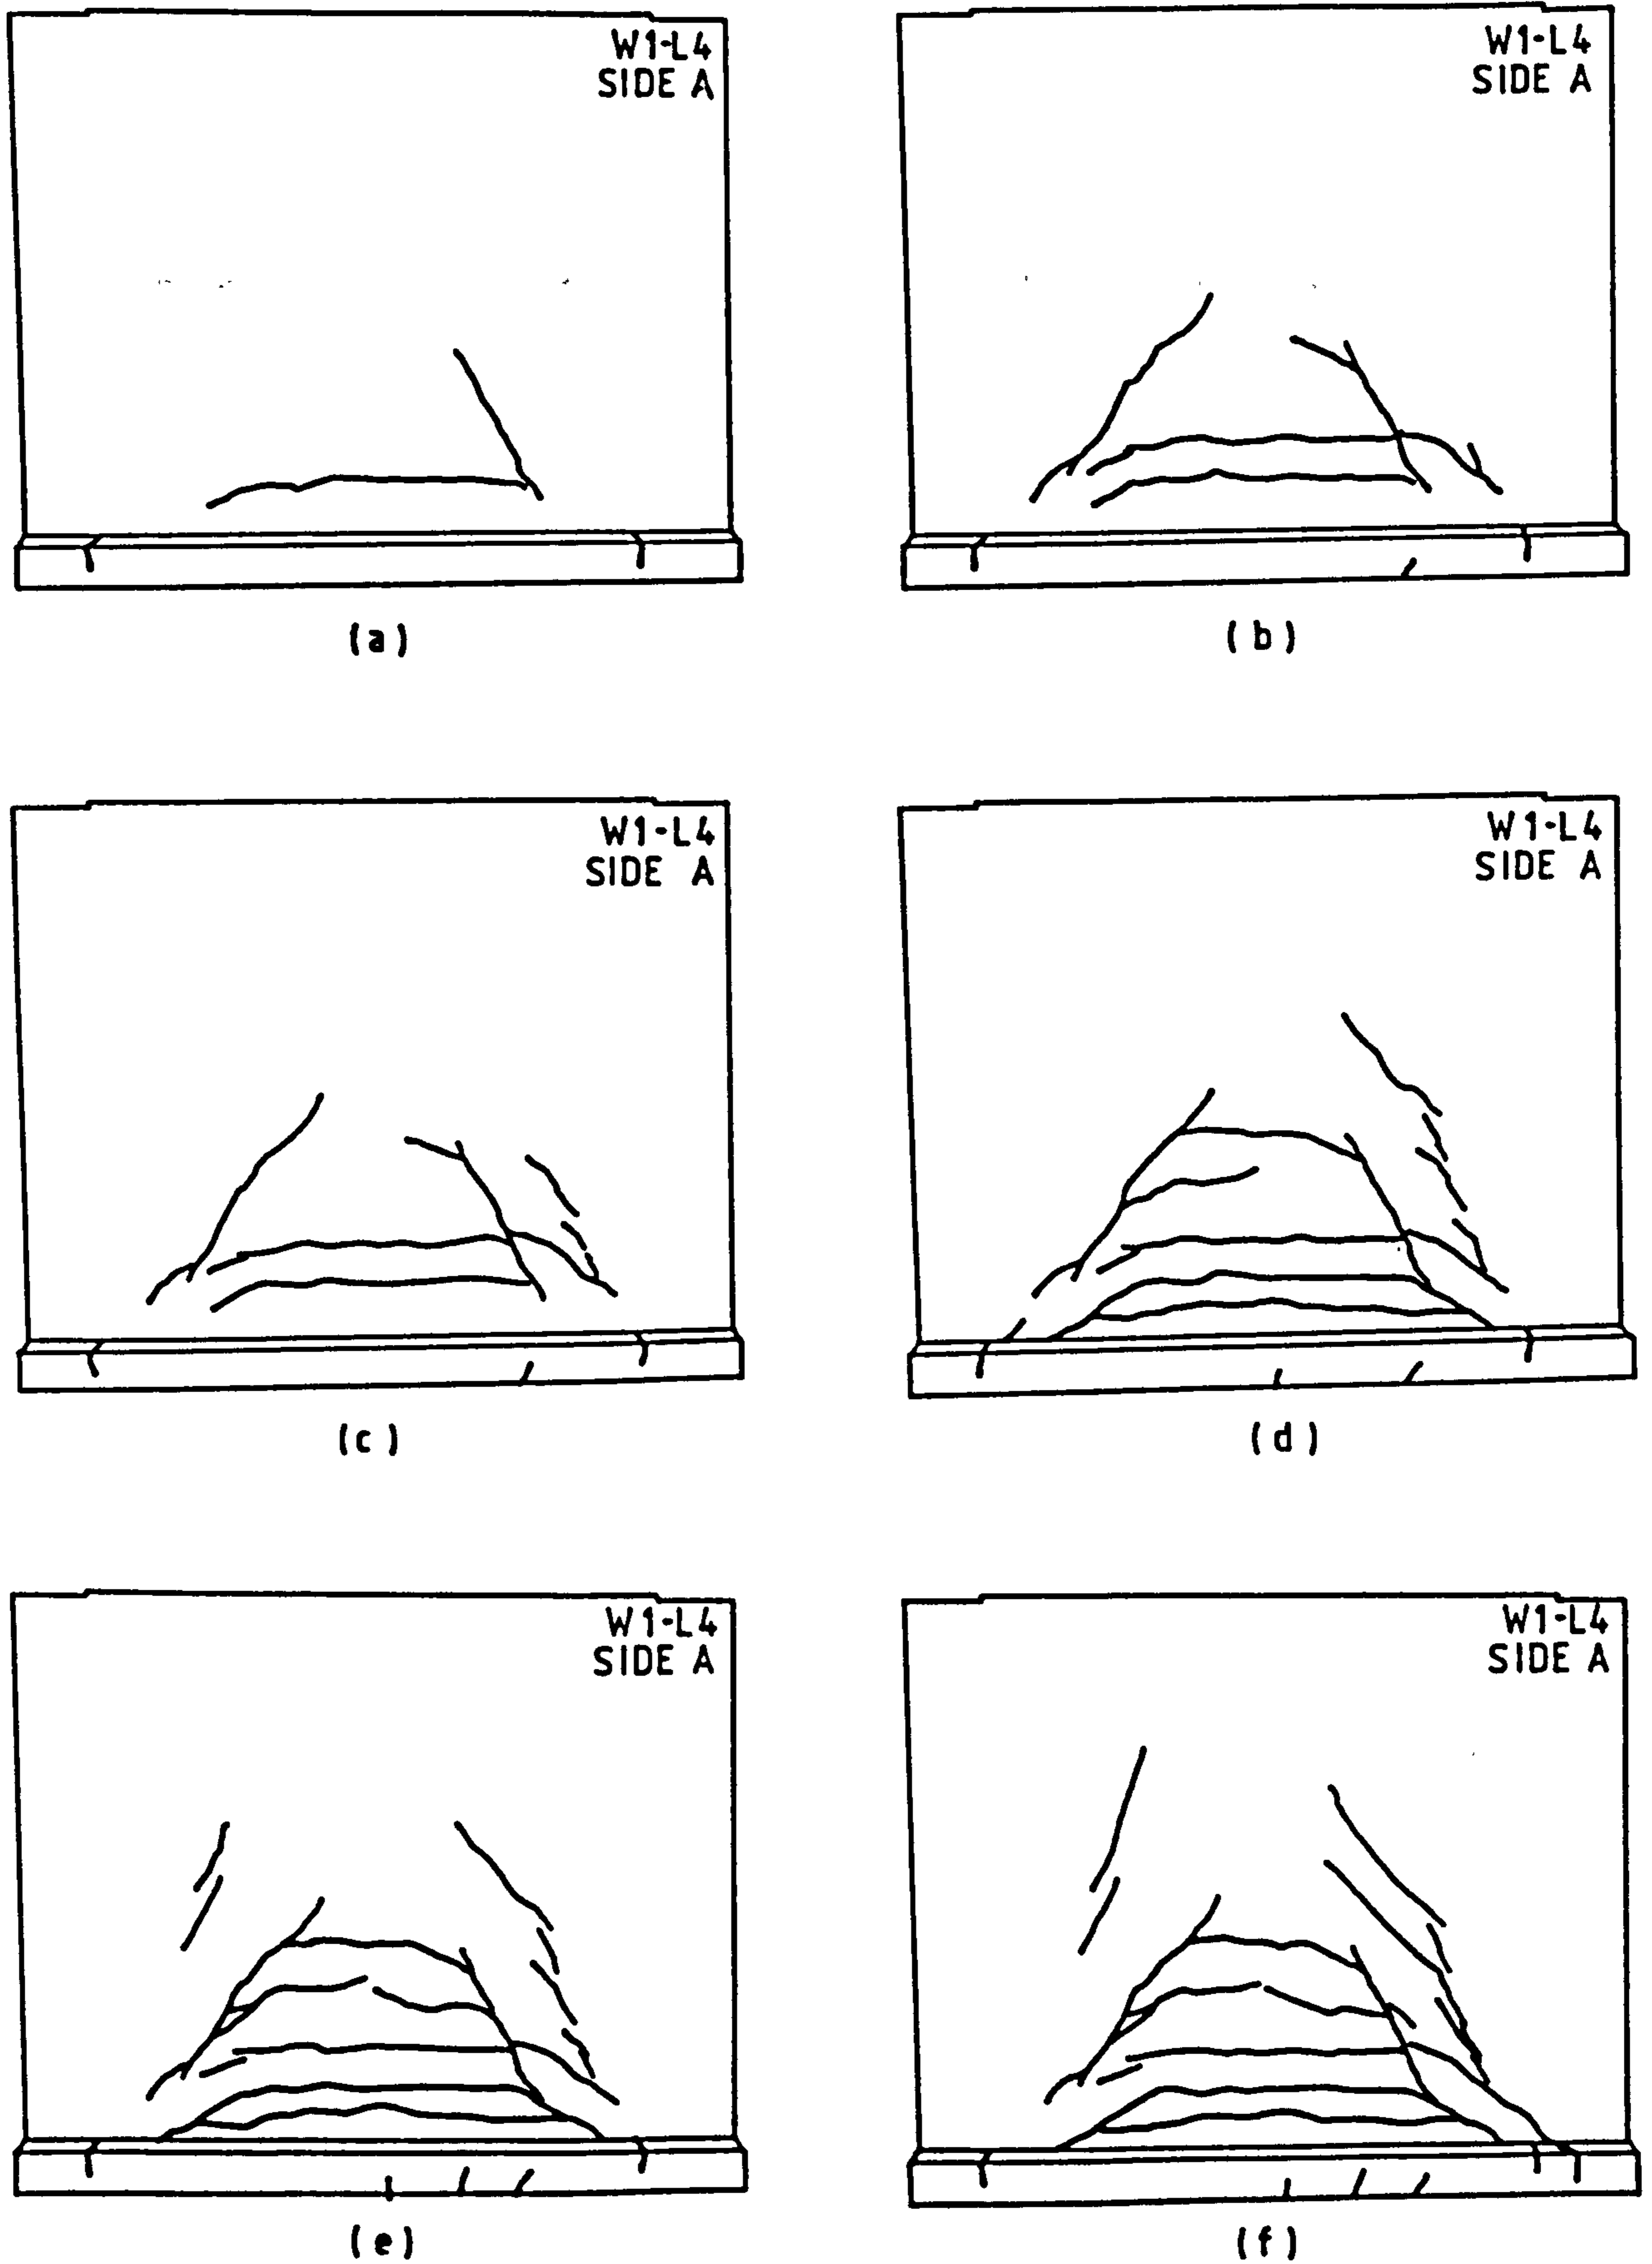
Development of cracks in wall W1-L4
